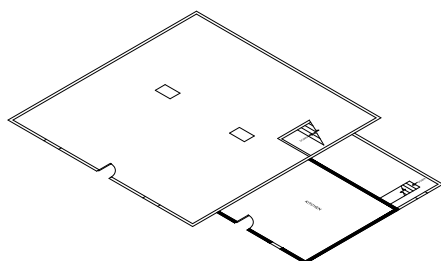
Pryor House, Phase I, ca. 1874, when Pryor bought it. Detail of 1872 bird's eye with conjectural first floor plan. The location of the kitchen is known, as indicated in black. The basement under the kitchen is the only part of this early house that survives today. The location of the stair from the leanto into the basement indicated here is conjectural based on the location of the current staircase into the basement.
